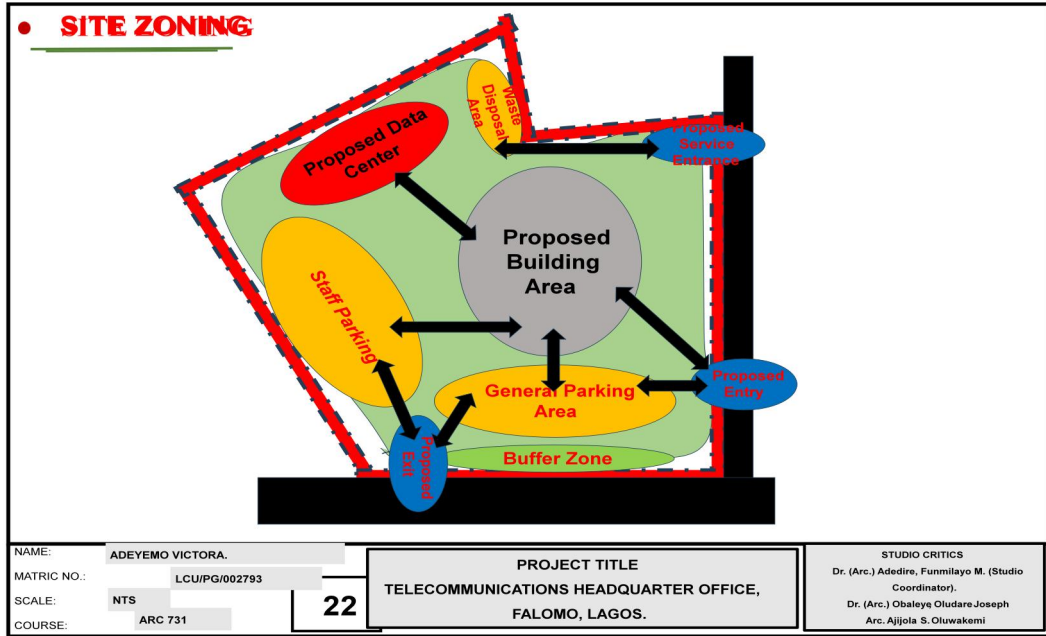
Site Zoning of the Proposed Telecom Building
